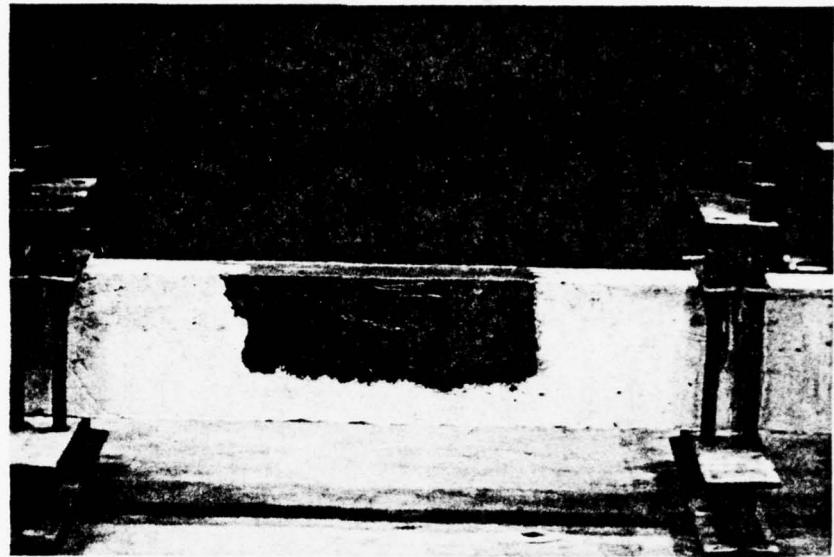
Close Up of Test Specimen T-2-E Showing External Stirrups Outside Constant Moment Region. Epoxy Concrete Block Is Shown Before Whitewashing.
